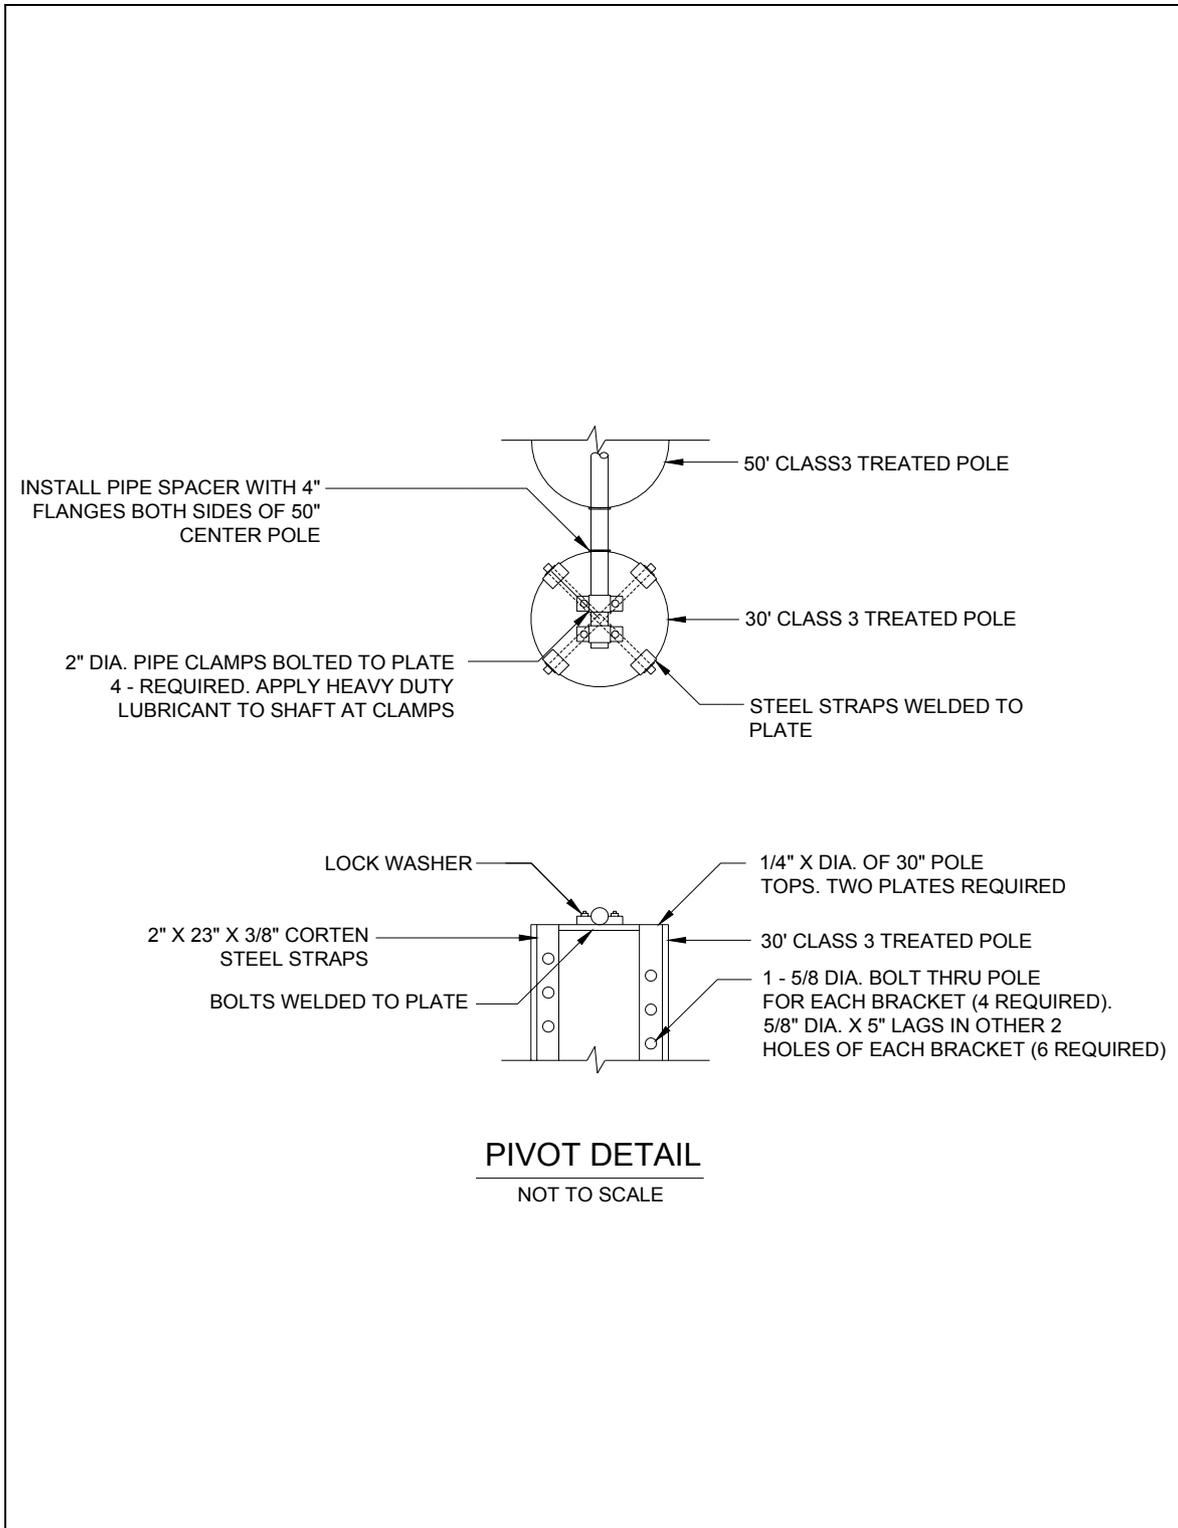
Standard Details for Pivoting Rotating Beacon Pole –Pivot Detail
